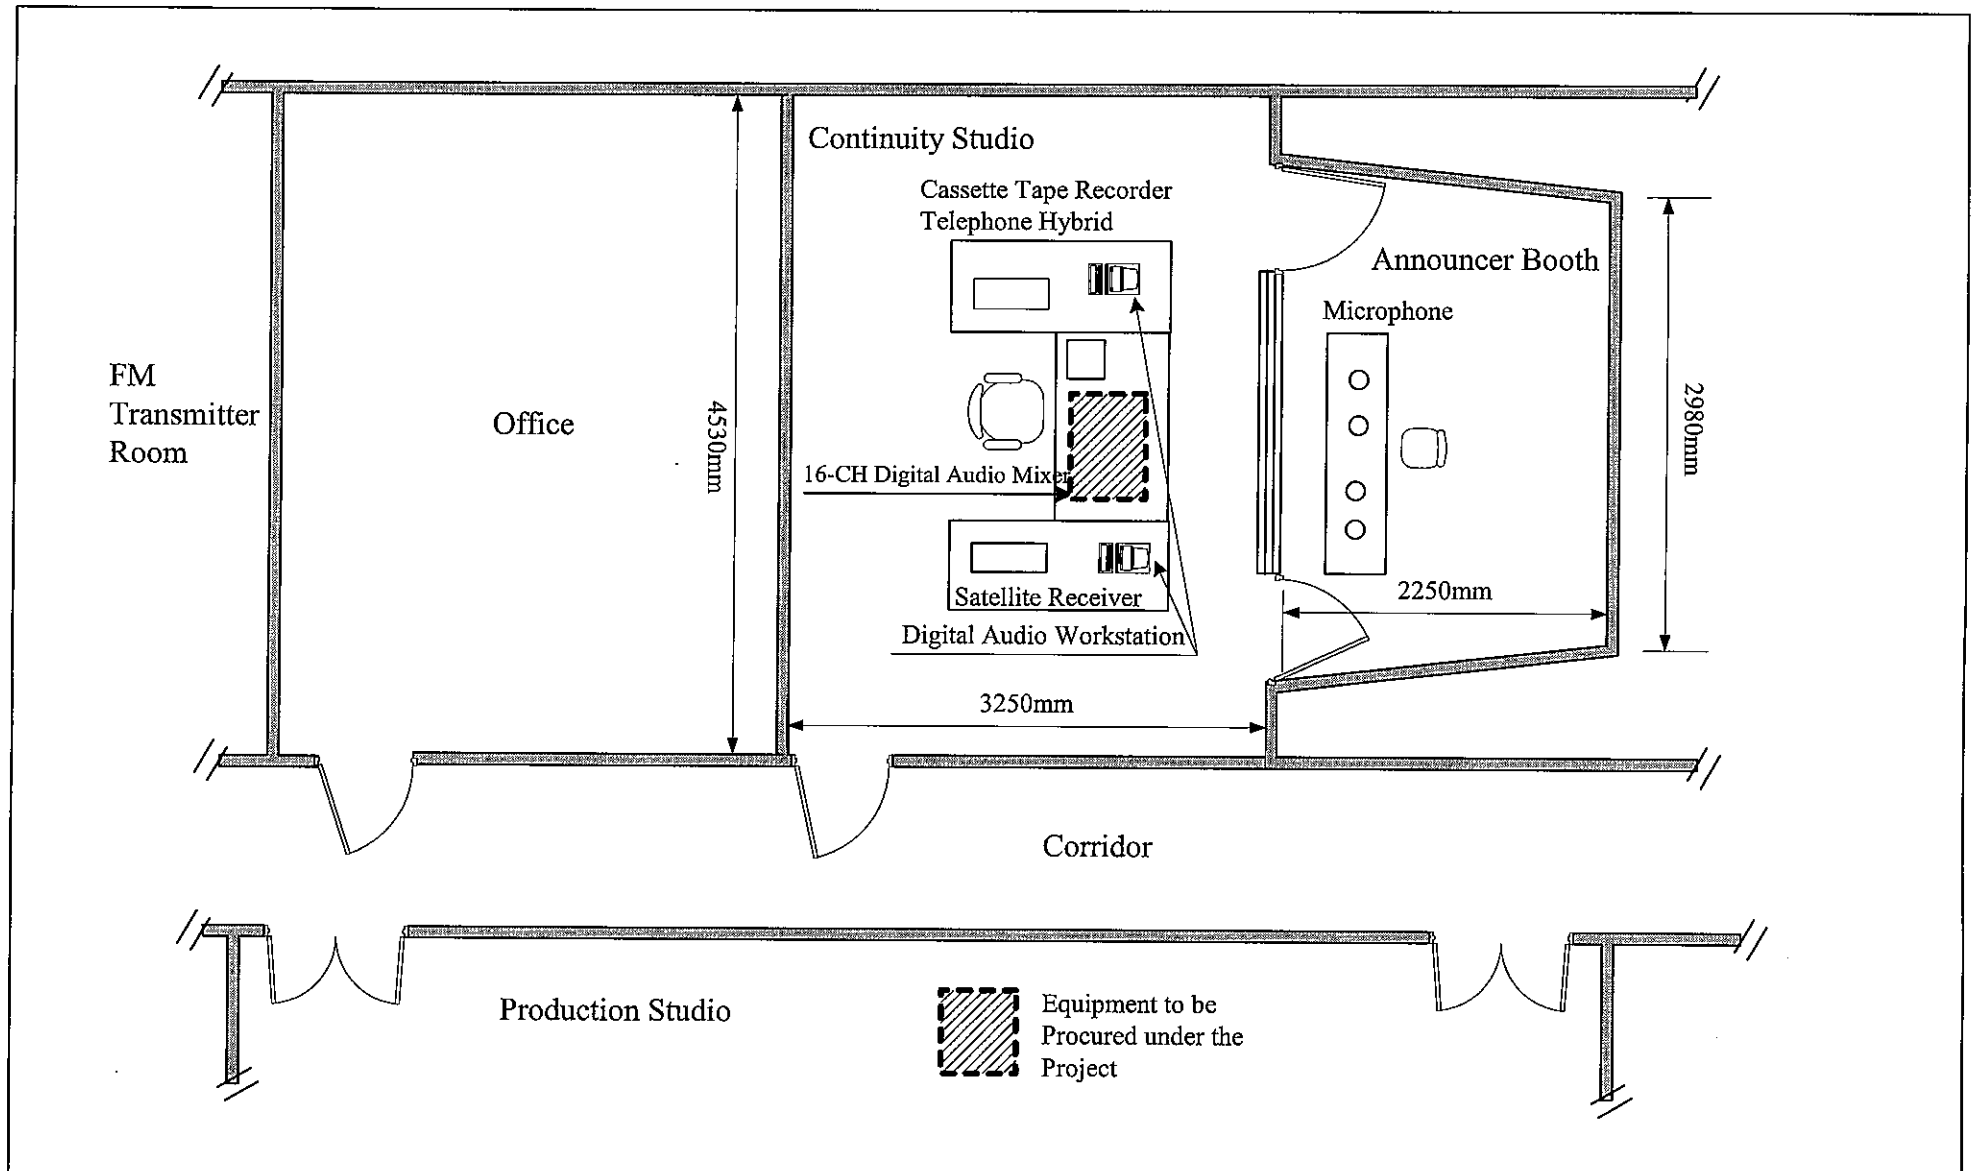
TARAKAN BROADCASTING STATION	FLOOR LAYOUT OF CONTINUITY STUDIO
